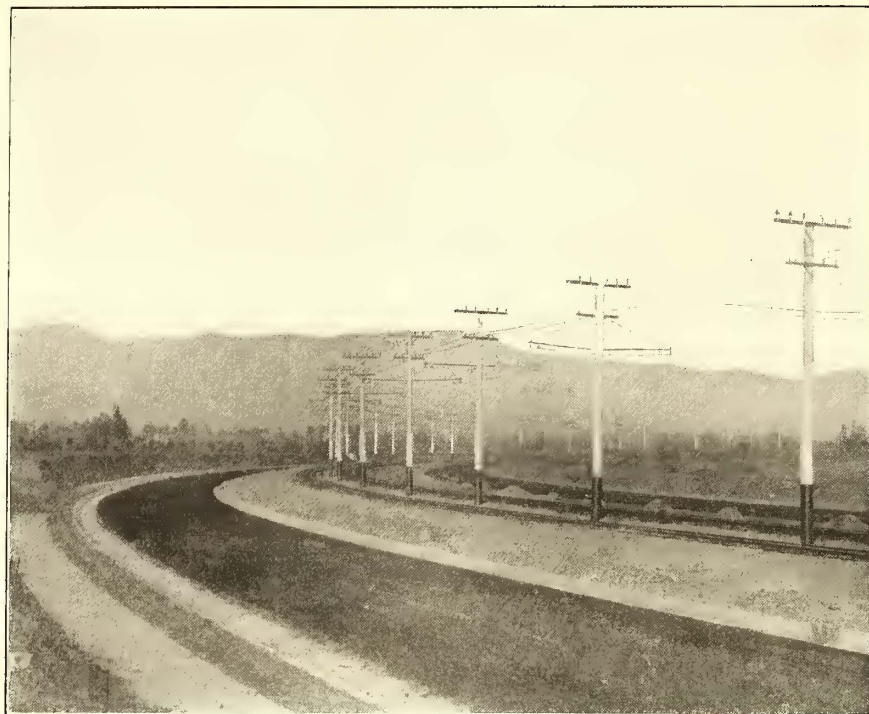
VIEW OF BOULEVARD—HUNTINGTON DRIVE
